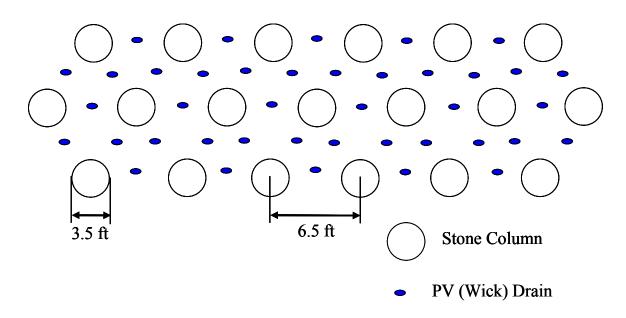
Equilateral triangle stone column and wick drain layout for the primary 27% A_r treatment at the Shepard Lane Bridge case history.
